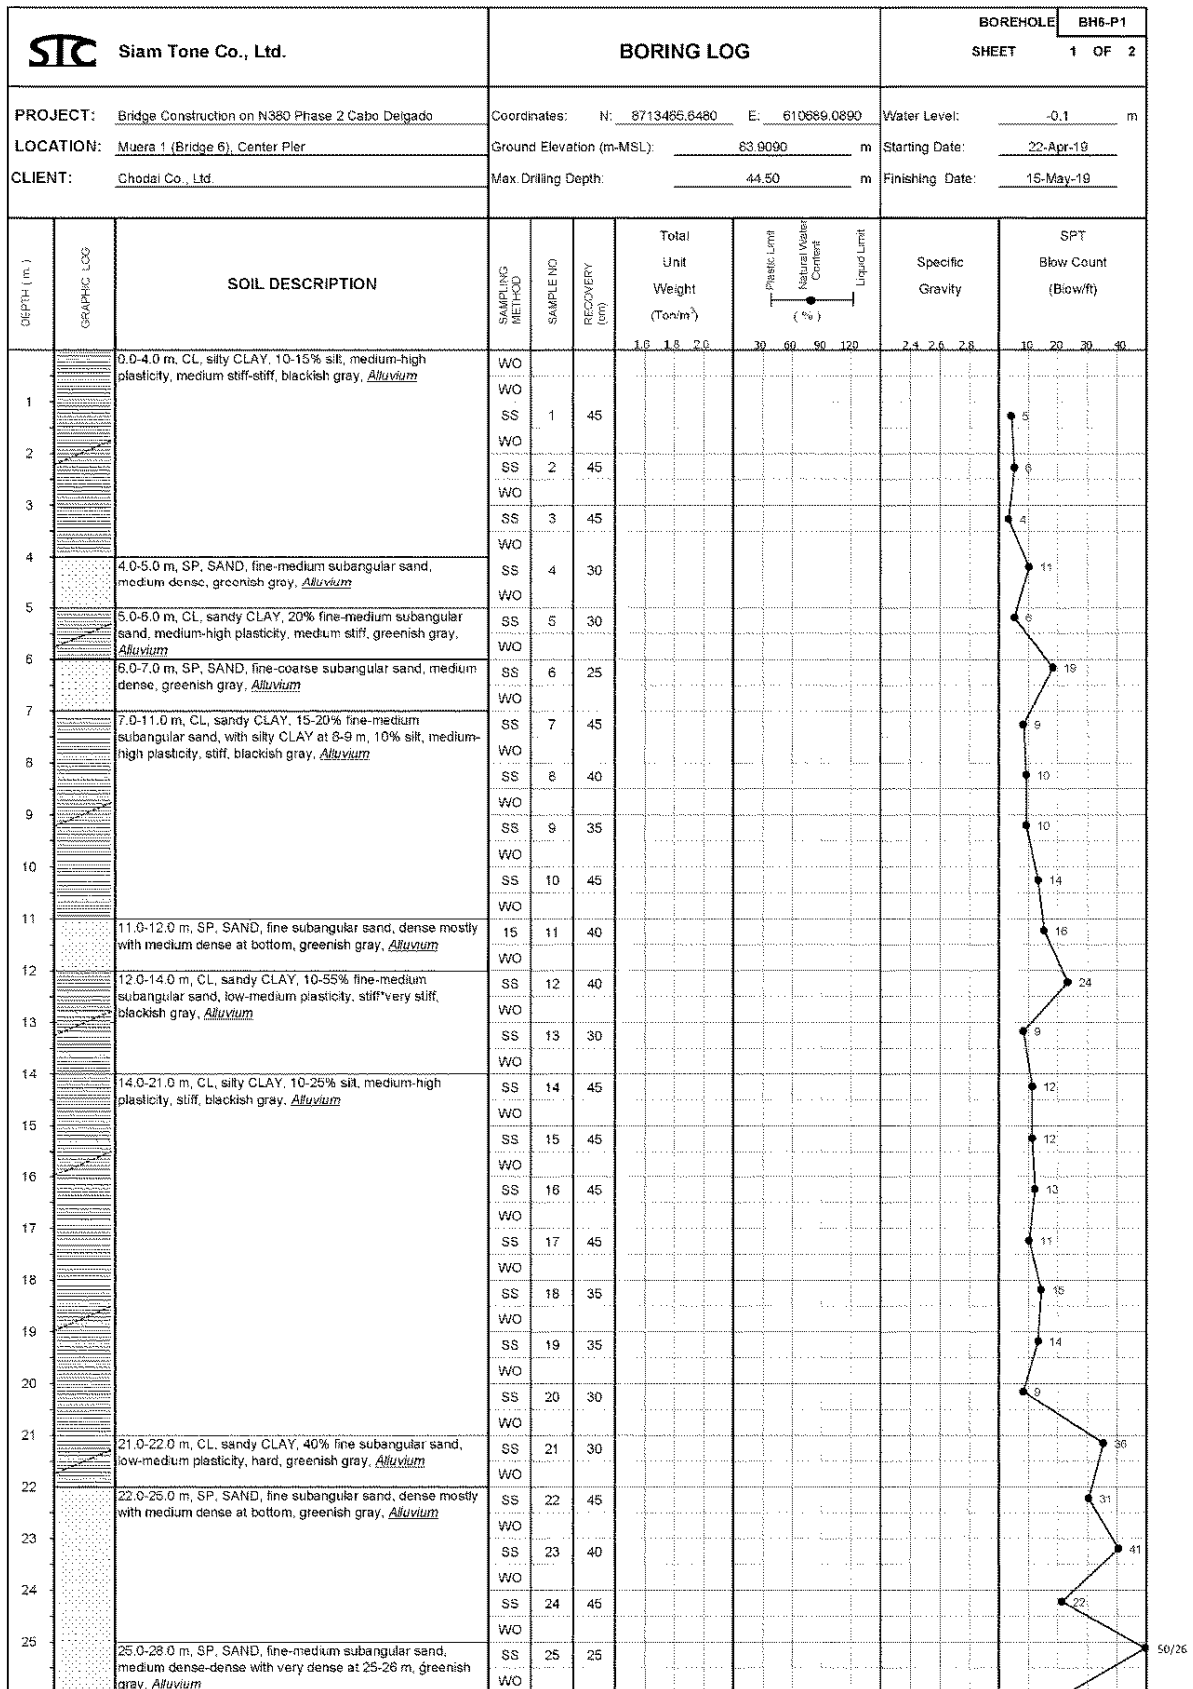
BH6-P1 at Central Pier of Muera I Bridge (B6)
